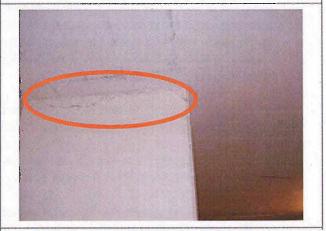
Delaminated concrete at the top of the column north of parking stall 63.
